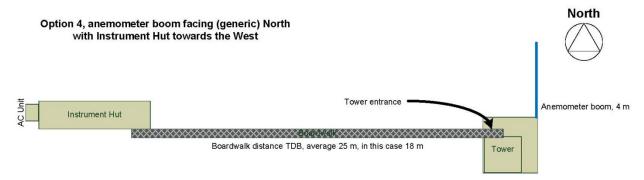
Generic diagram to demonstration the relationship between tower and instrument hut when boom facing north and instrument hut on the west towards the tower.
